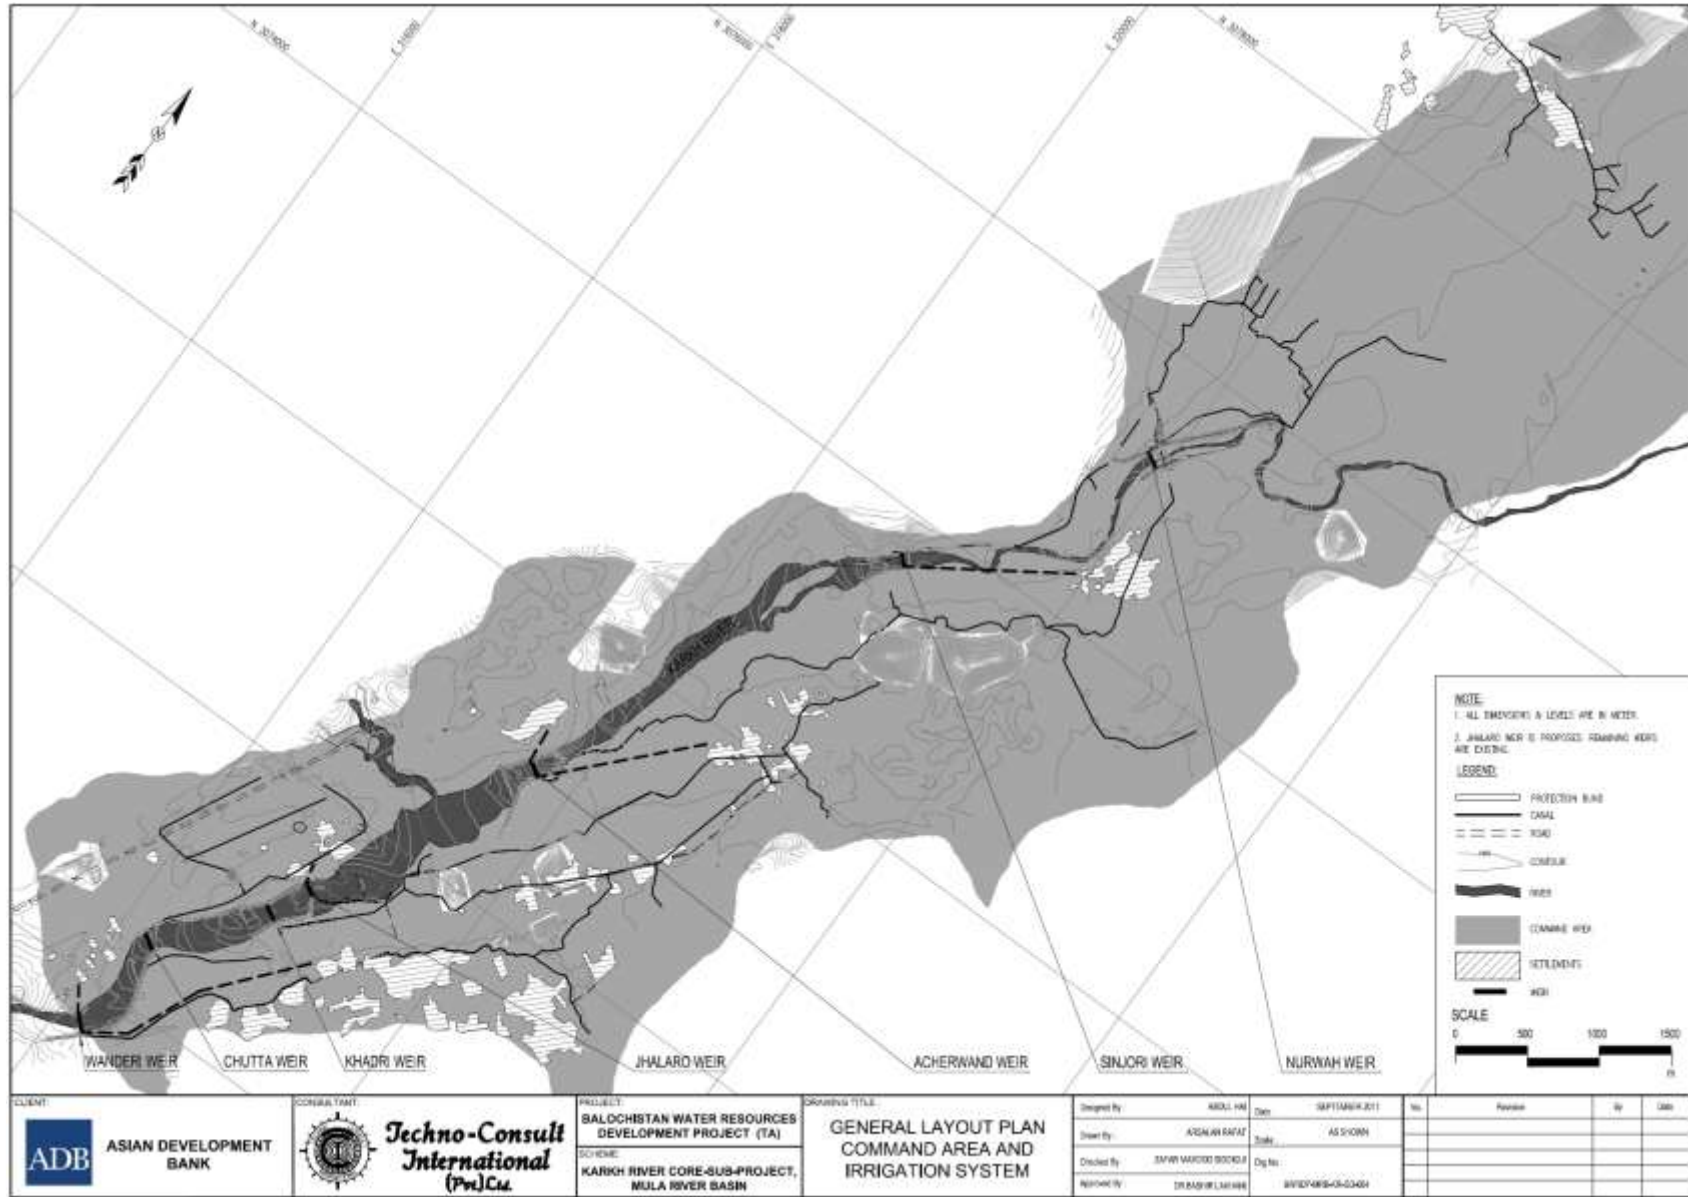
Layout Plan of the Subproject (Feasibility Stage)
